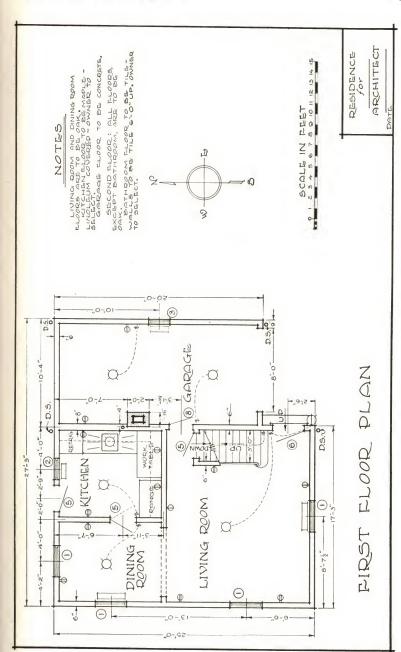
First-Floor Plan for House Shown in Fig. 30
